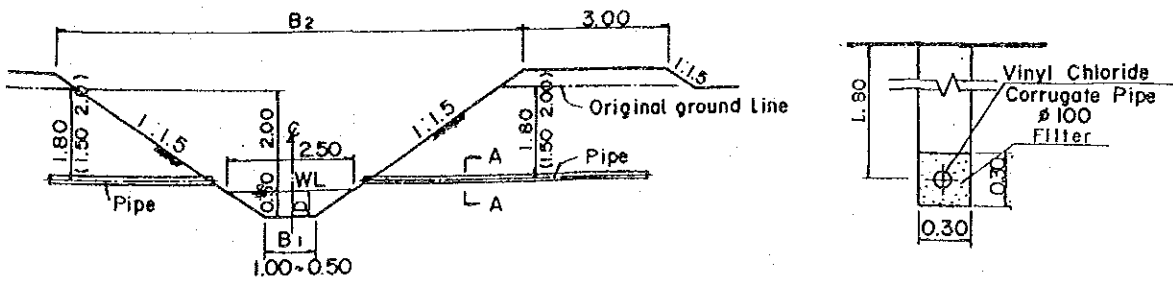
TYPICAL CROSS SECTION OF DRAINAGE CANAL AND PIPE DRAIN
